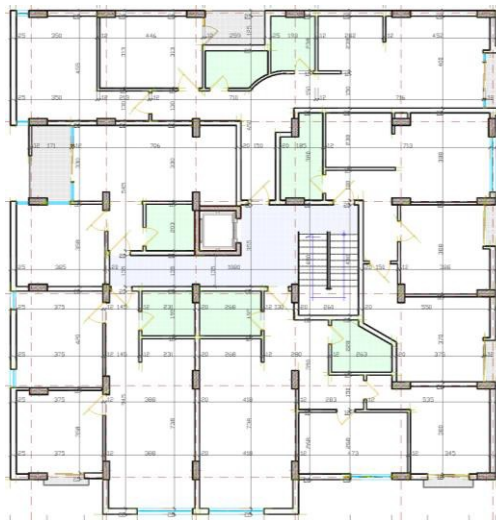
Typical floor plan of a 10-storey building with irregular column orientation
